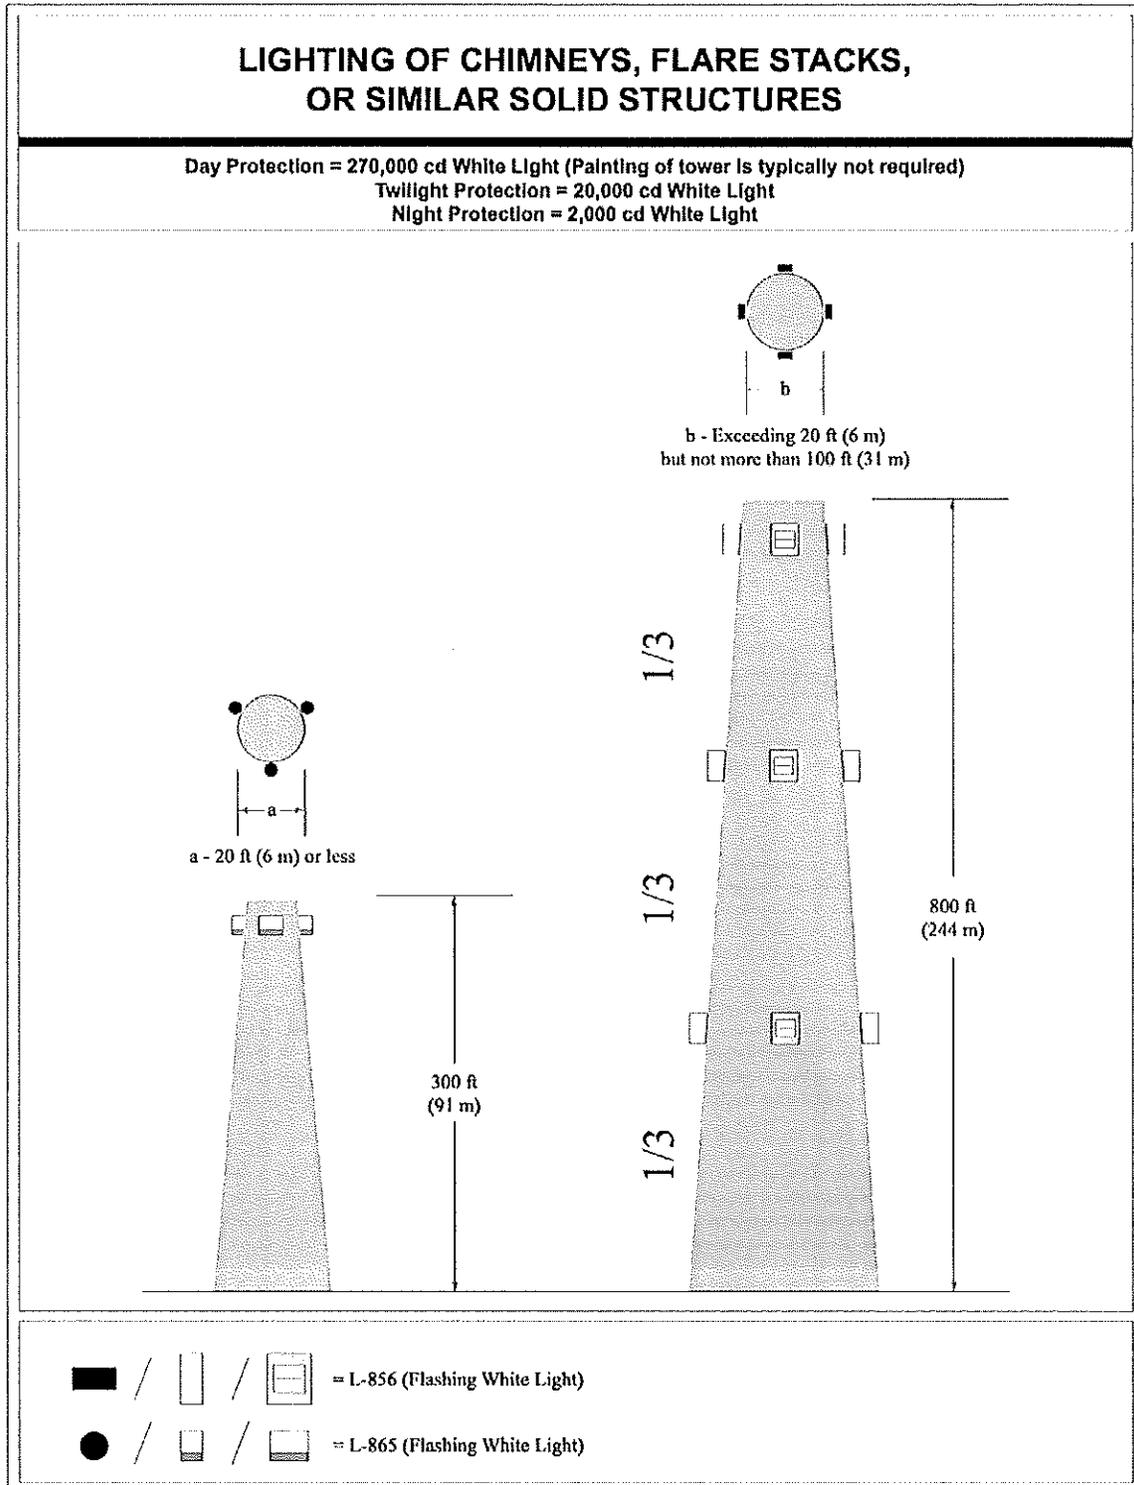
Lighting of Chimneys, Flare Stacks, or Similar Solid Structures
